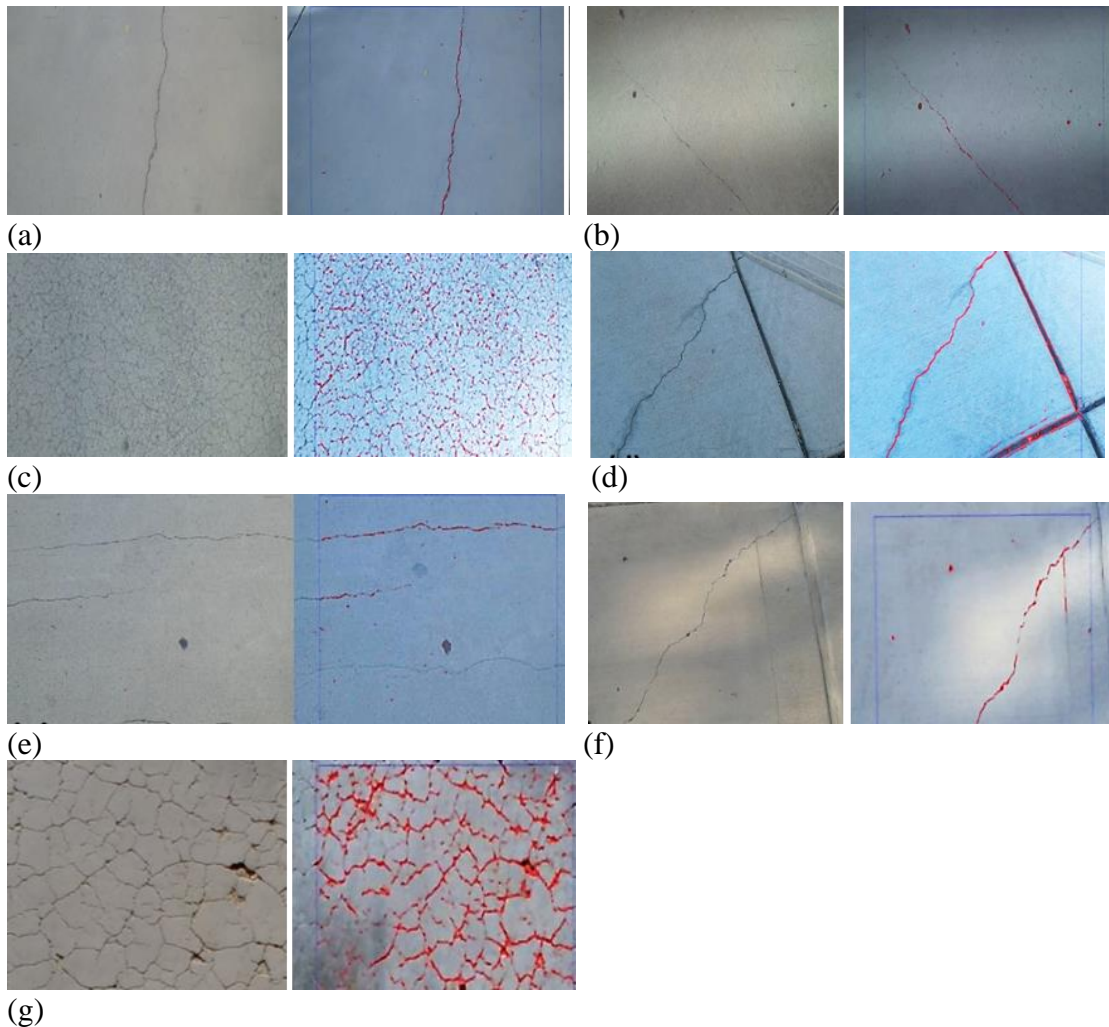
Resulting photos for different types of cracks a) longitudinal crack, b) traverse crack, c) craze crack, d) corner crack, e) D- crack, f) diagonal crack, g) map crack.
